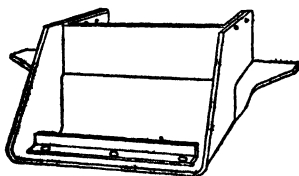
Duplex Extra-heavy Wall-hanger for Large Wooden Girder
